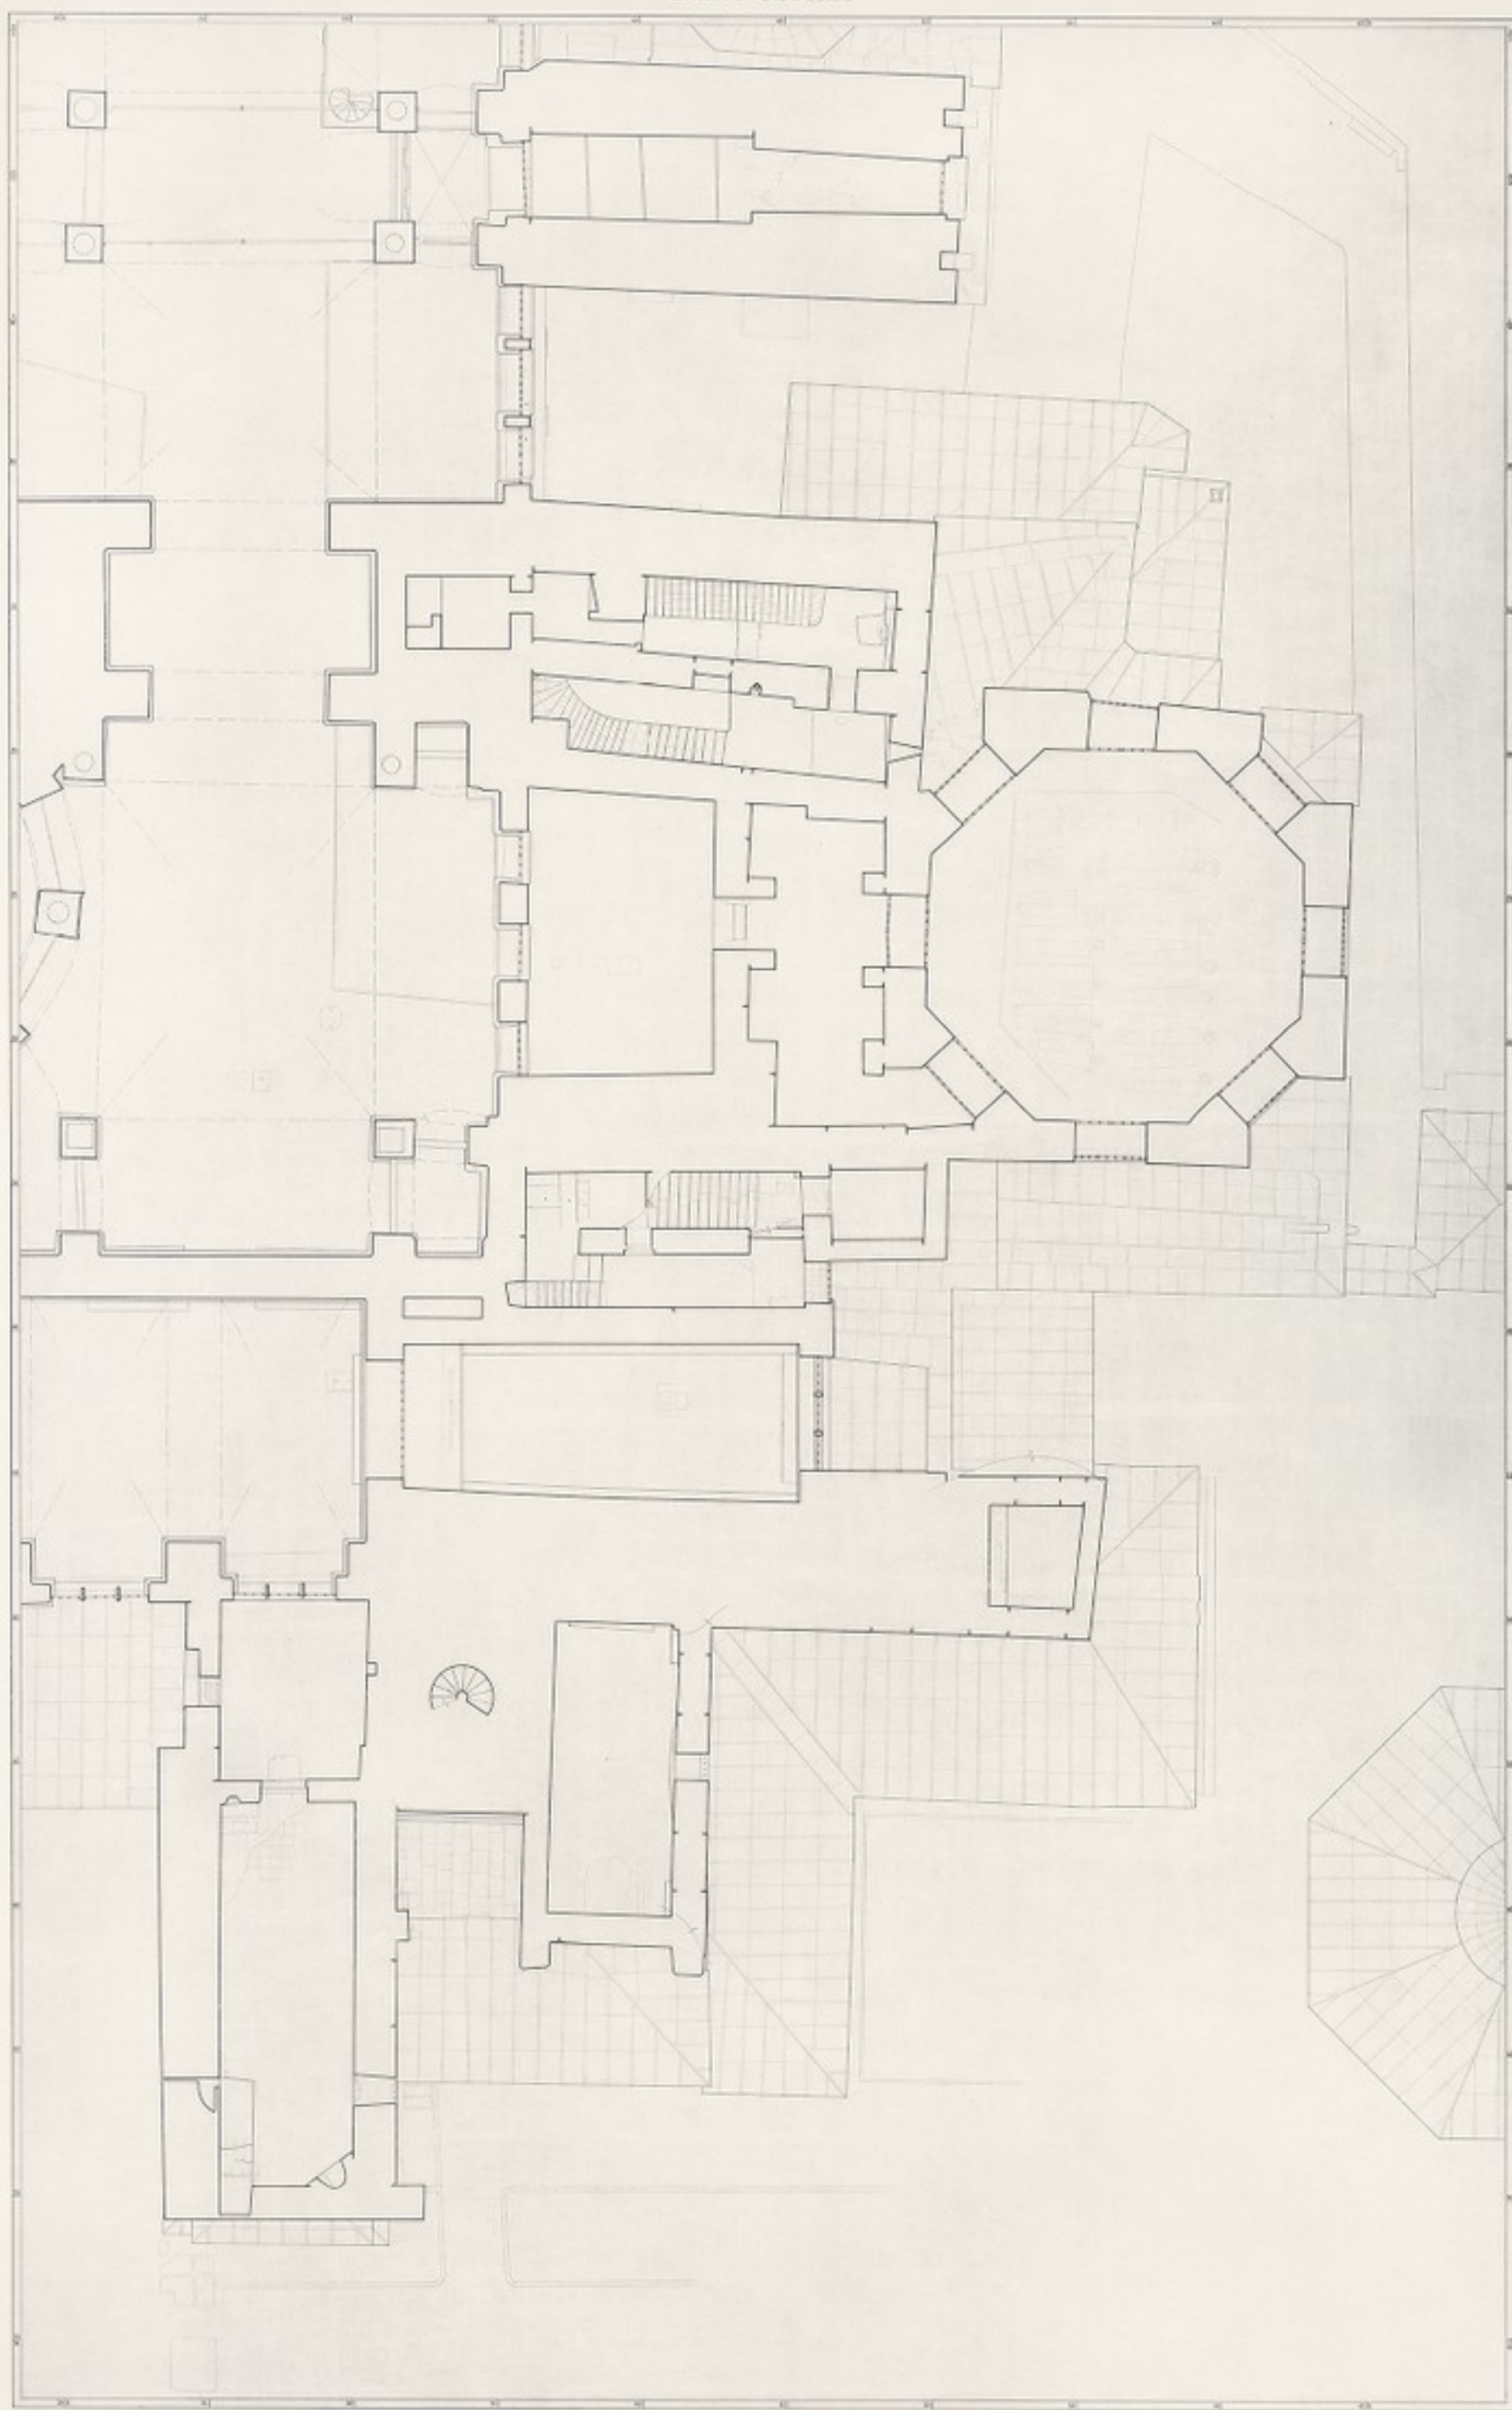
PLAN AT INTERMEDIATE LEVEL, SOUTHWESTERN EXTERIOR AREAS:
